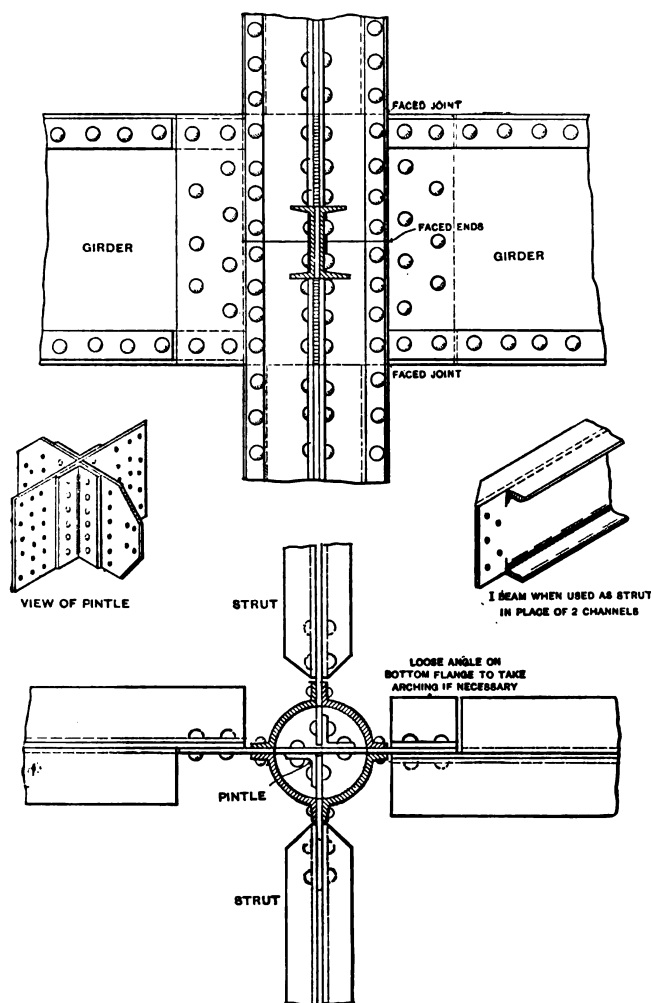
Cross Pintle Connection, Showing Method of Joining Girders and Struts.
